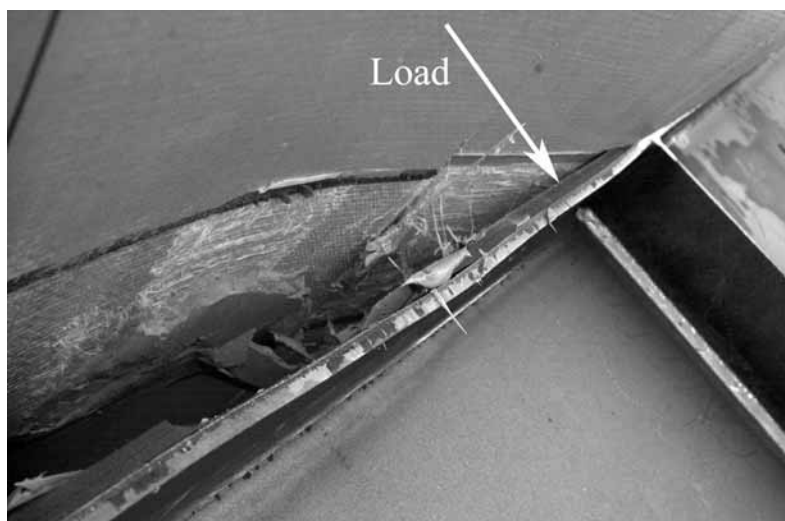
Detachment of the deck between jacks after initial failure. Large plastic deformation of the top steel flange, girder Fix 2.
